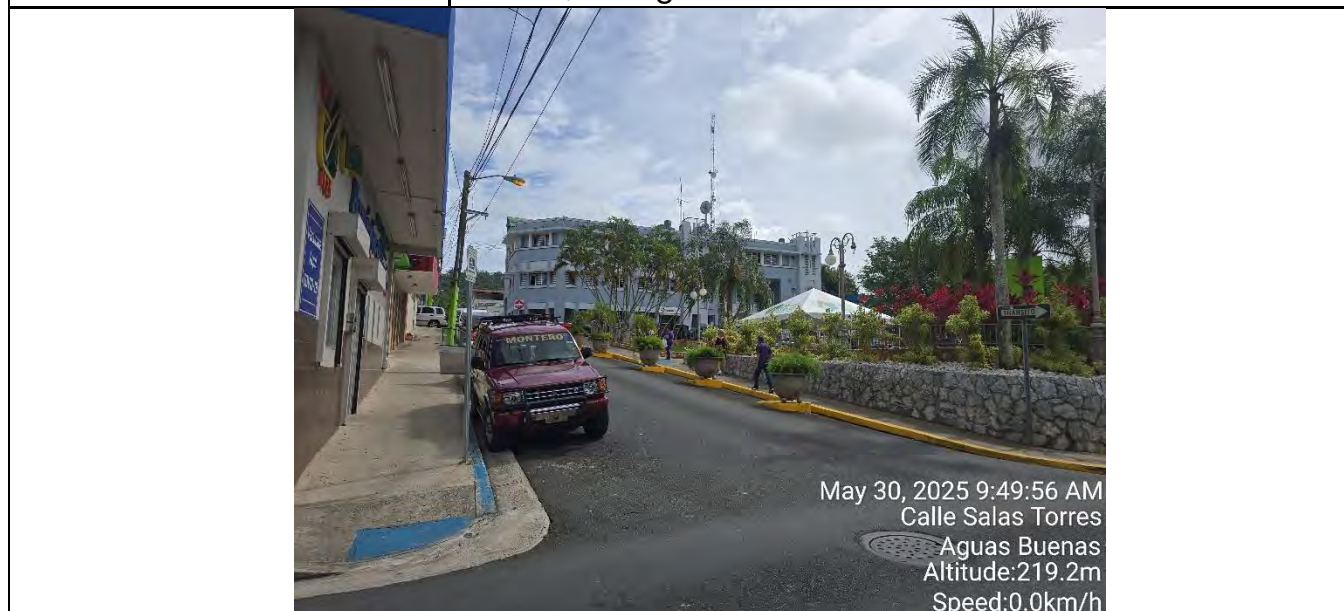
Description: Streetscape, Intersection of Luis Munoz Rivera and Salas Torres Streets, facing southwest.
